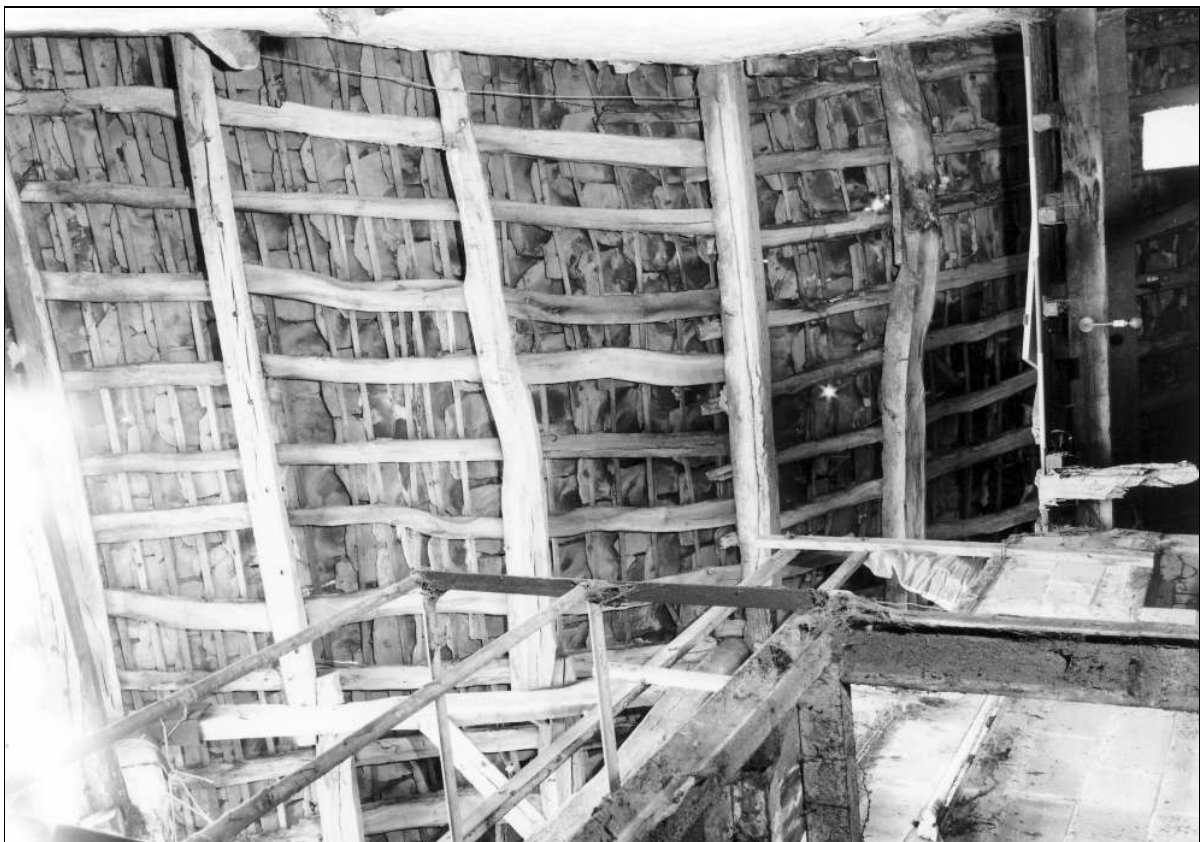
Barn roof: north-west pitch (film 5, frame 5)
